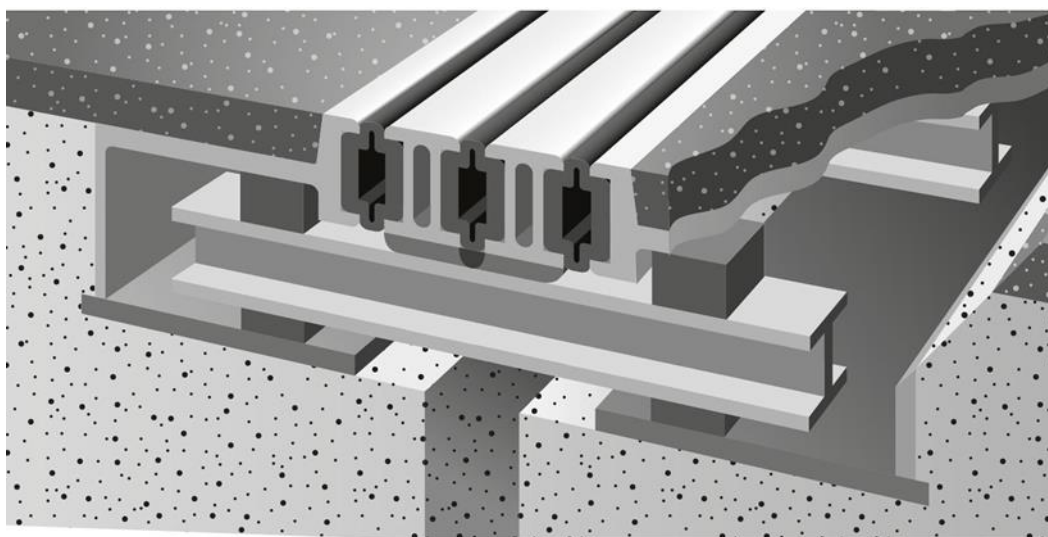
Typical arrangement of a multi-element modular expansion joint (Source Ref 1.I)
